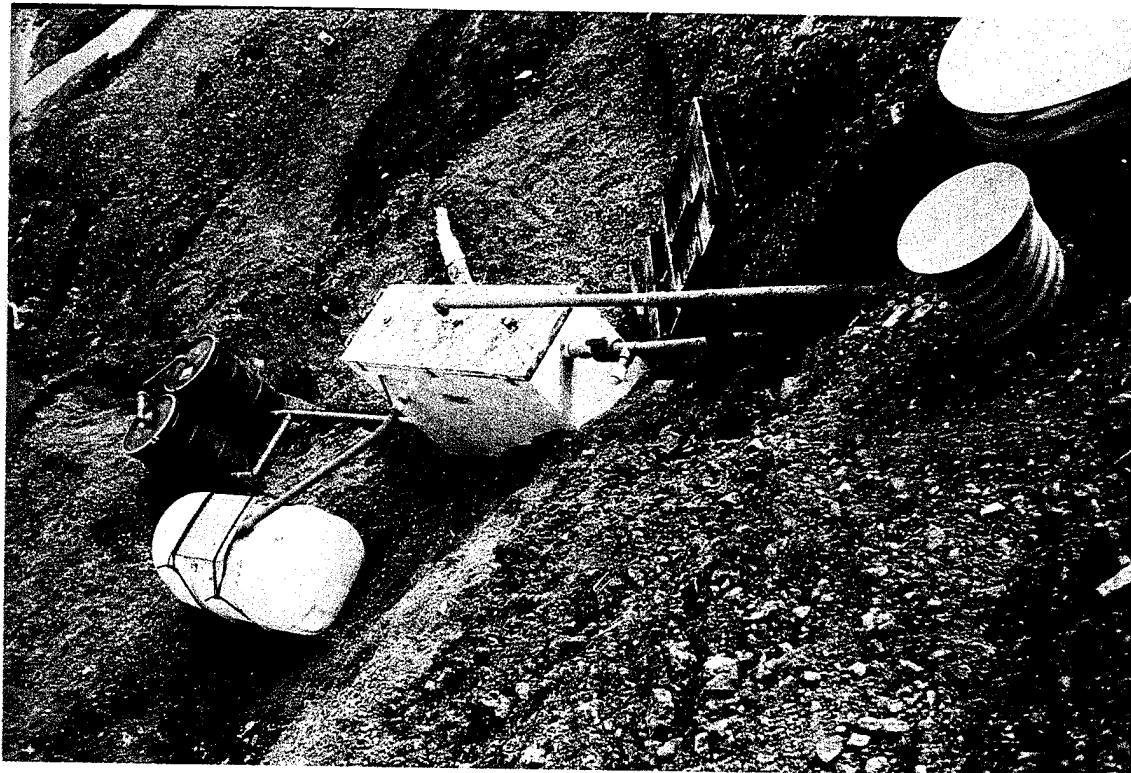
The east and west trenches were sloped to the sump collection area.
